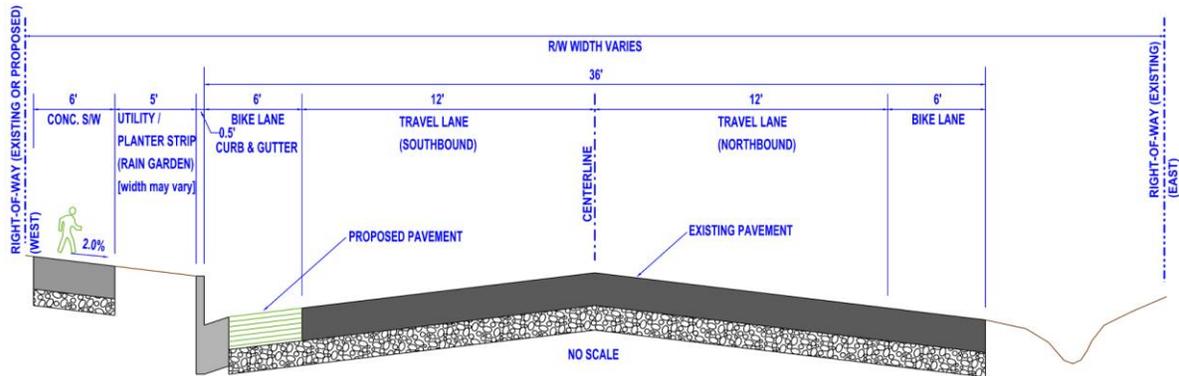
COLLEGE STREET TYPICAL CROSS SECTION (MINOR ARTERIAL FULL WIDTH STANDARD)
